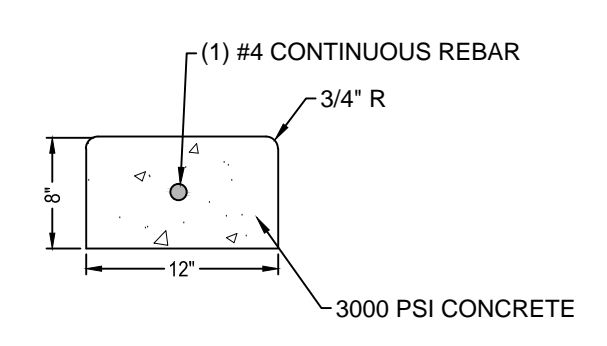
DETAIL TYPICAL PRECAST CONCRETE WHEEL STOP
